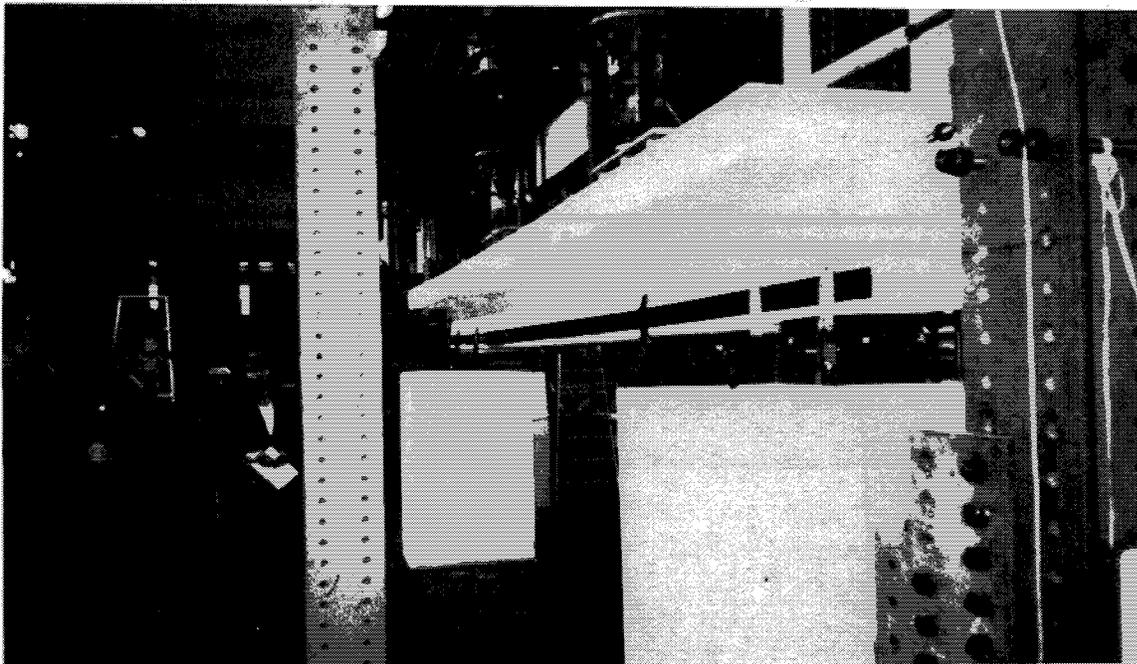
External CFRP Laminate Strengthening on T-Girder Web
